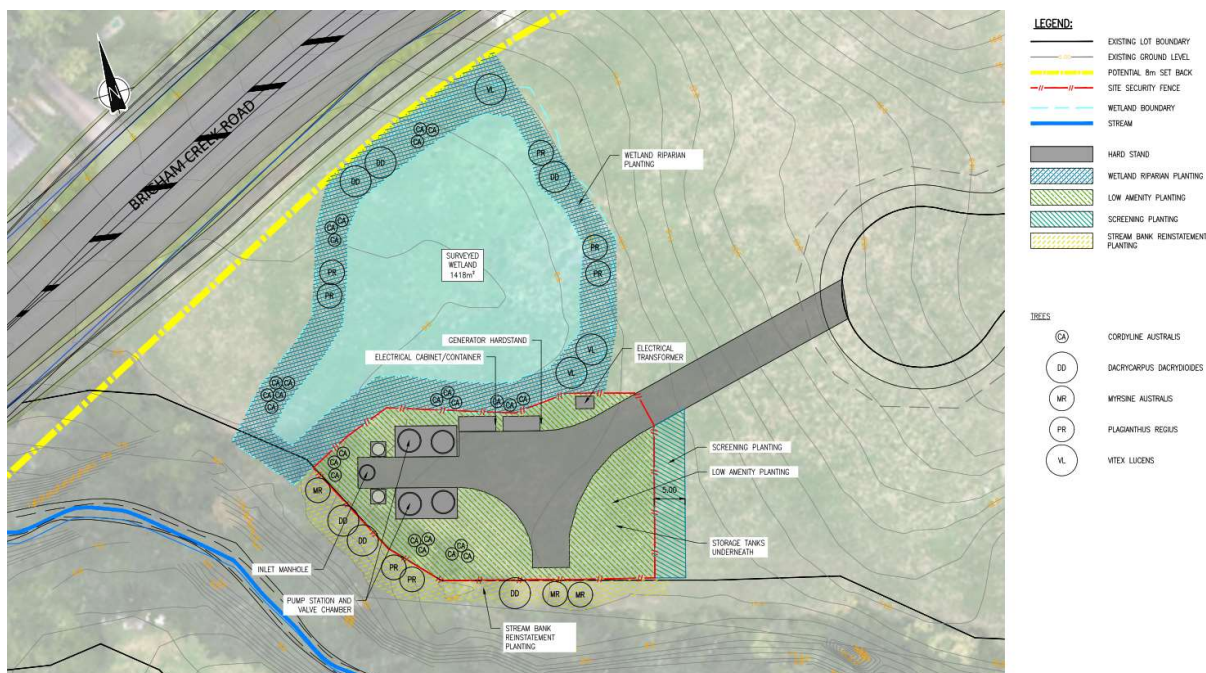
Pump station landscape plan (snip from Drawing 2013646.001, WSP GHD, provided in Appendix A)
